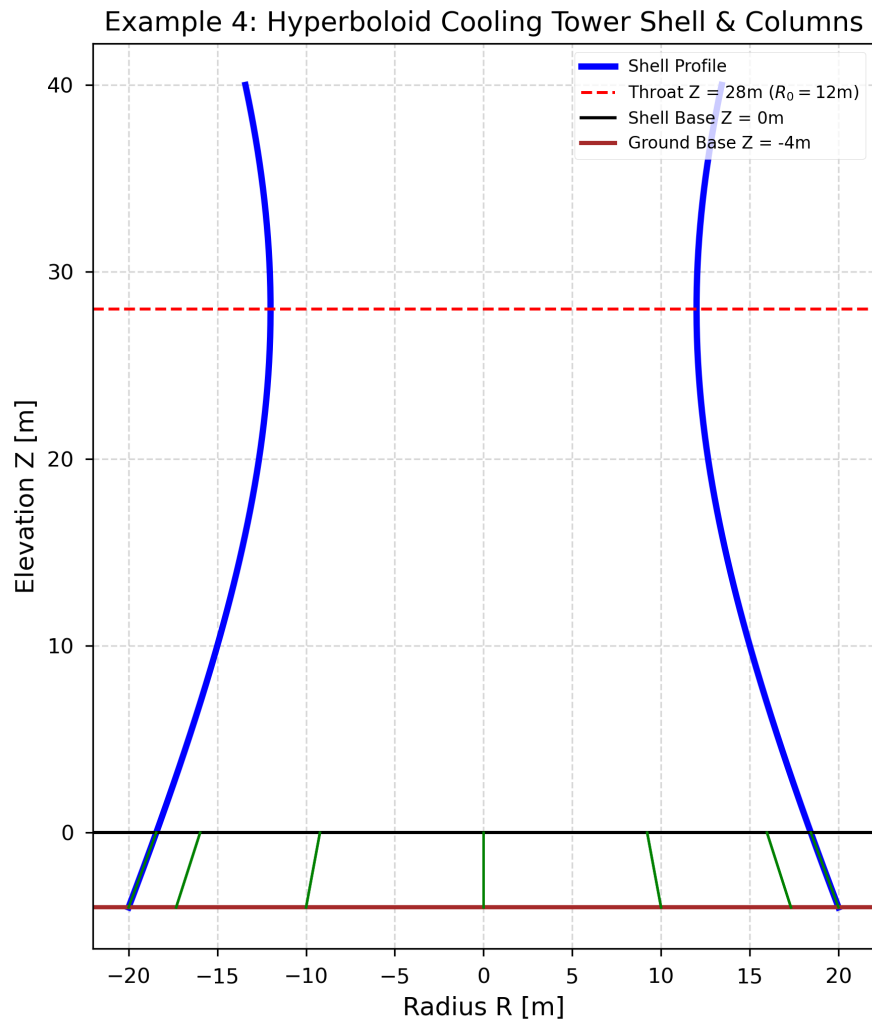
Hyperboloid Profile Geometry, Throat Elevation, and V-Leg Supporting Columns for Example 4.
